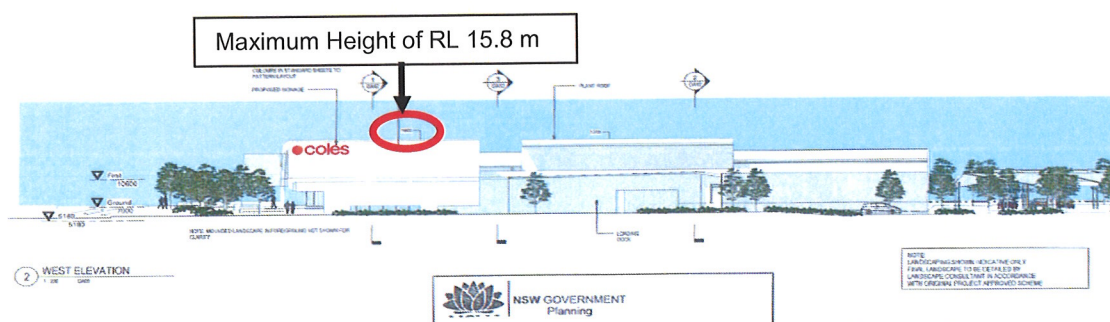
Maximum Approved Building Height as Identified on the Western Elevation
